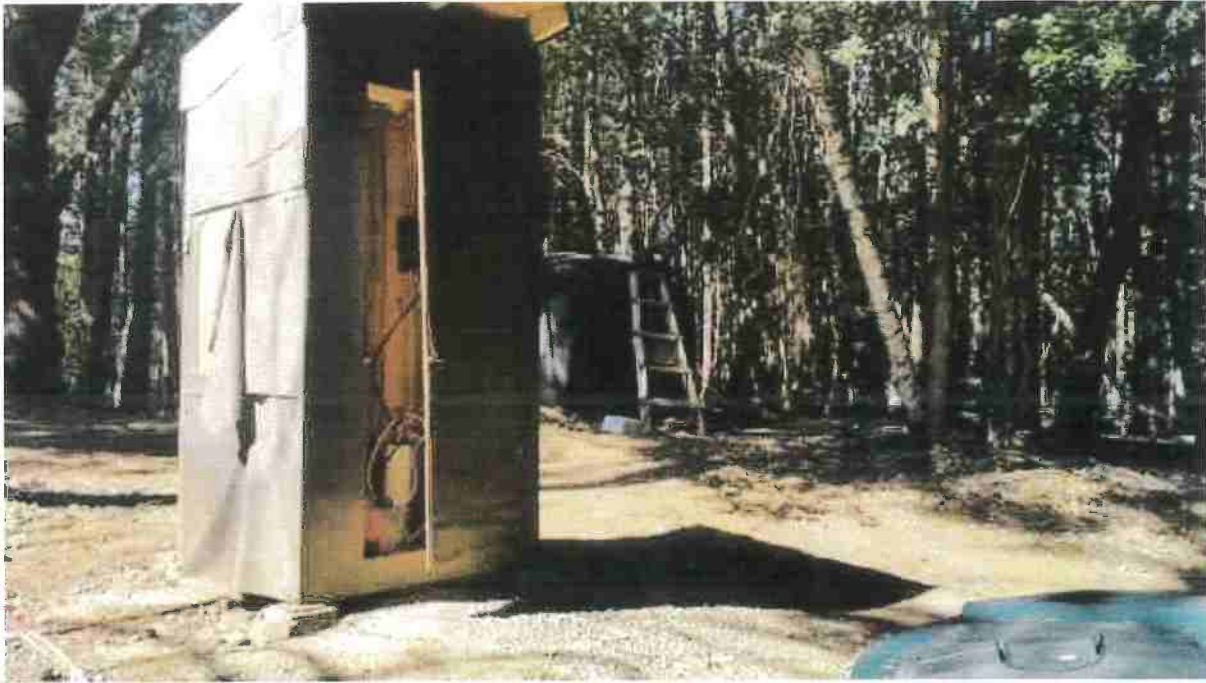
North of Site C, well shed (storage tanks visible across road; solar panel behind photographer)
